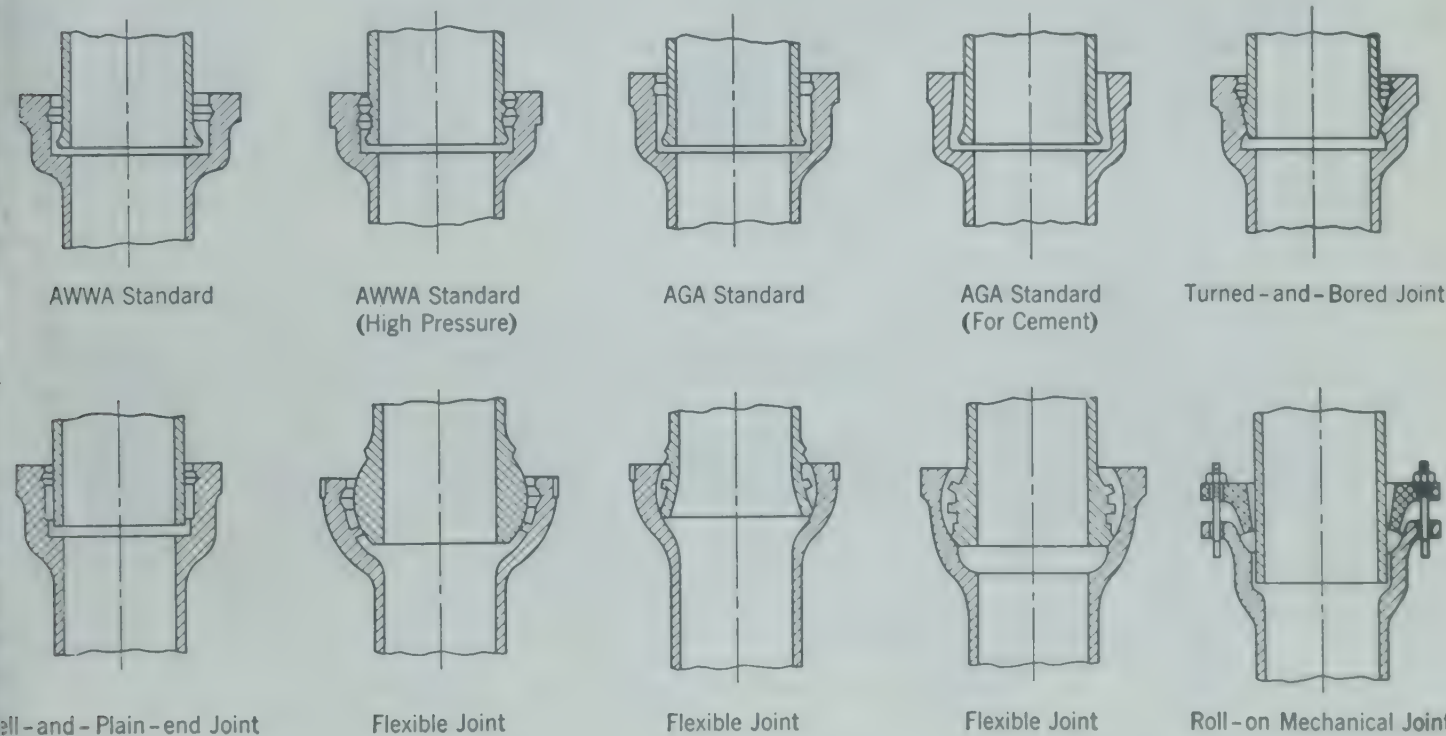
Sectional drawings of various bell-and-spigot joints.
